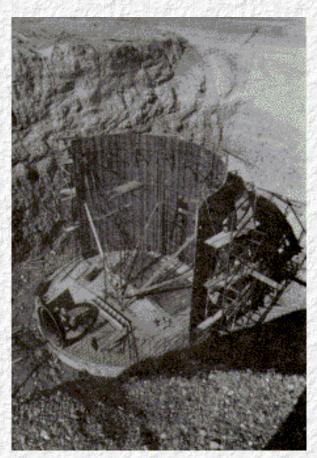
Circular Pit Construction in Open Cut Where Soil Is Favorable
